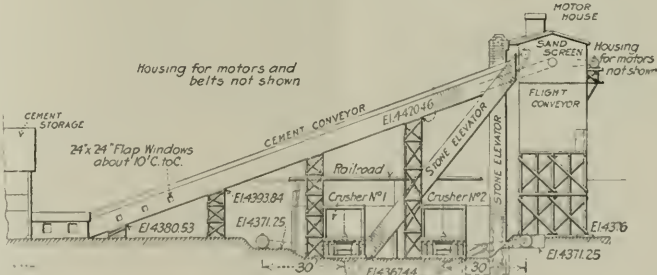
GENERAL ELEVATION OF MIXING, CRUSHING AND ELEVATING PLANTS
